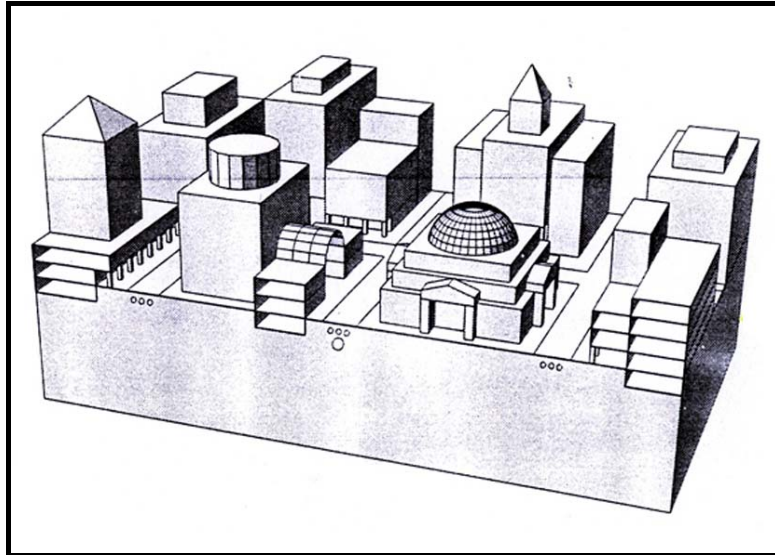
Underground Utilization in Minimal Degree (Source: Sterling, 1993).
